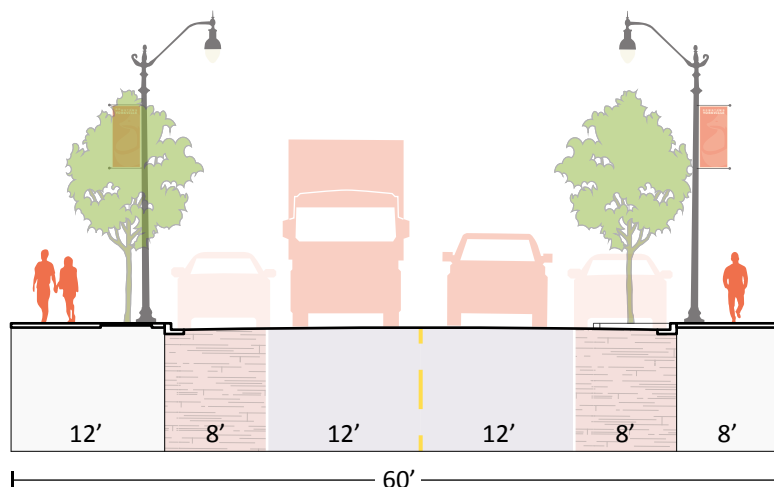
C (1). Van Emmon Street (Long-term).
